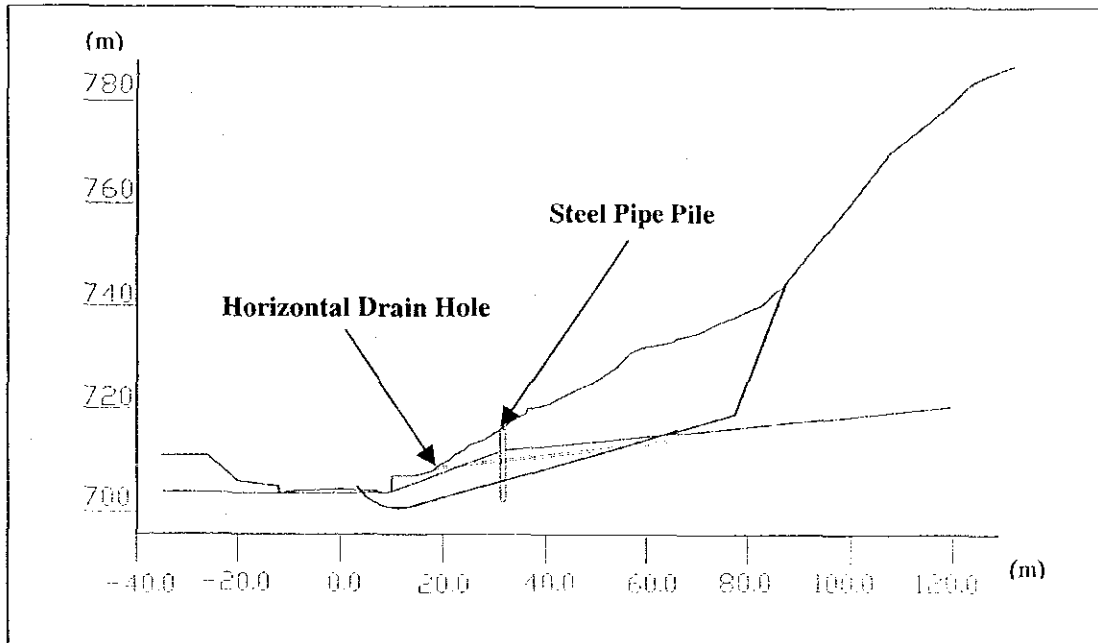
Cross section of Steel-pipe pile works at CH 81.30 km.
